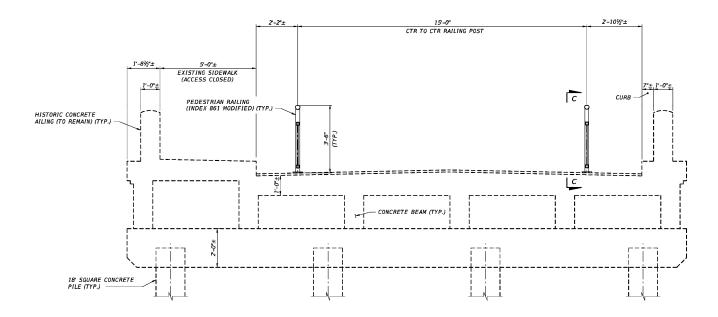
BUILD ALTERNATIVE 3 – EXISTING BRIDGE TO REMAIN
